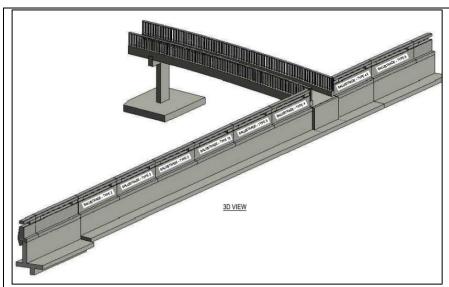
3D View of Typical Bridge and Retaining Wall (source: GIBB, 2021)
